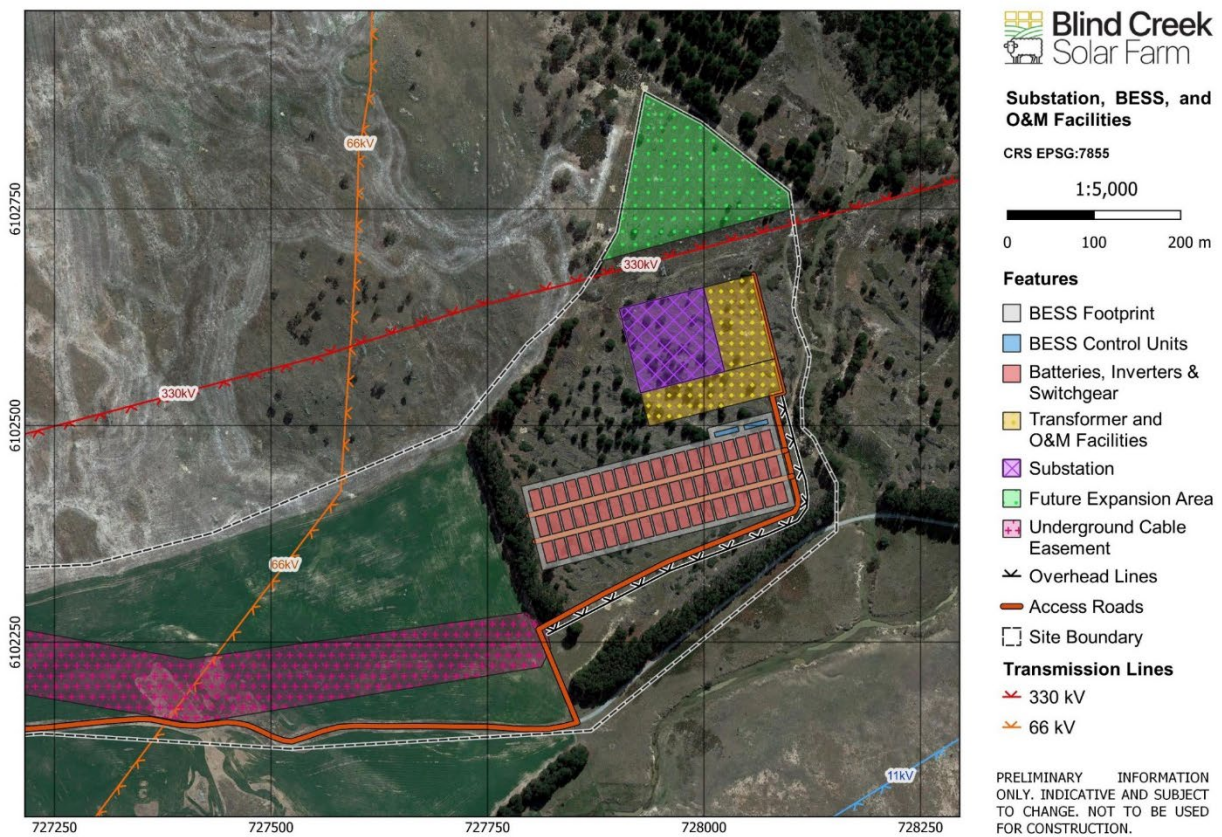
Indicative placement of the battery storage facility nearby to the onsite substation at Blind Creek Solar Farm, for an AC-coupled configuration. Precise layout is subject to detailed design.
